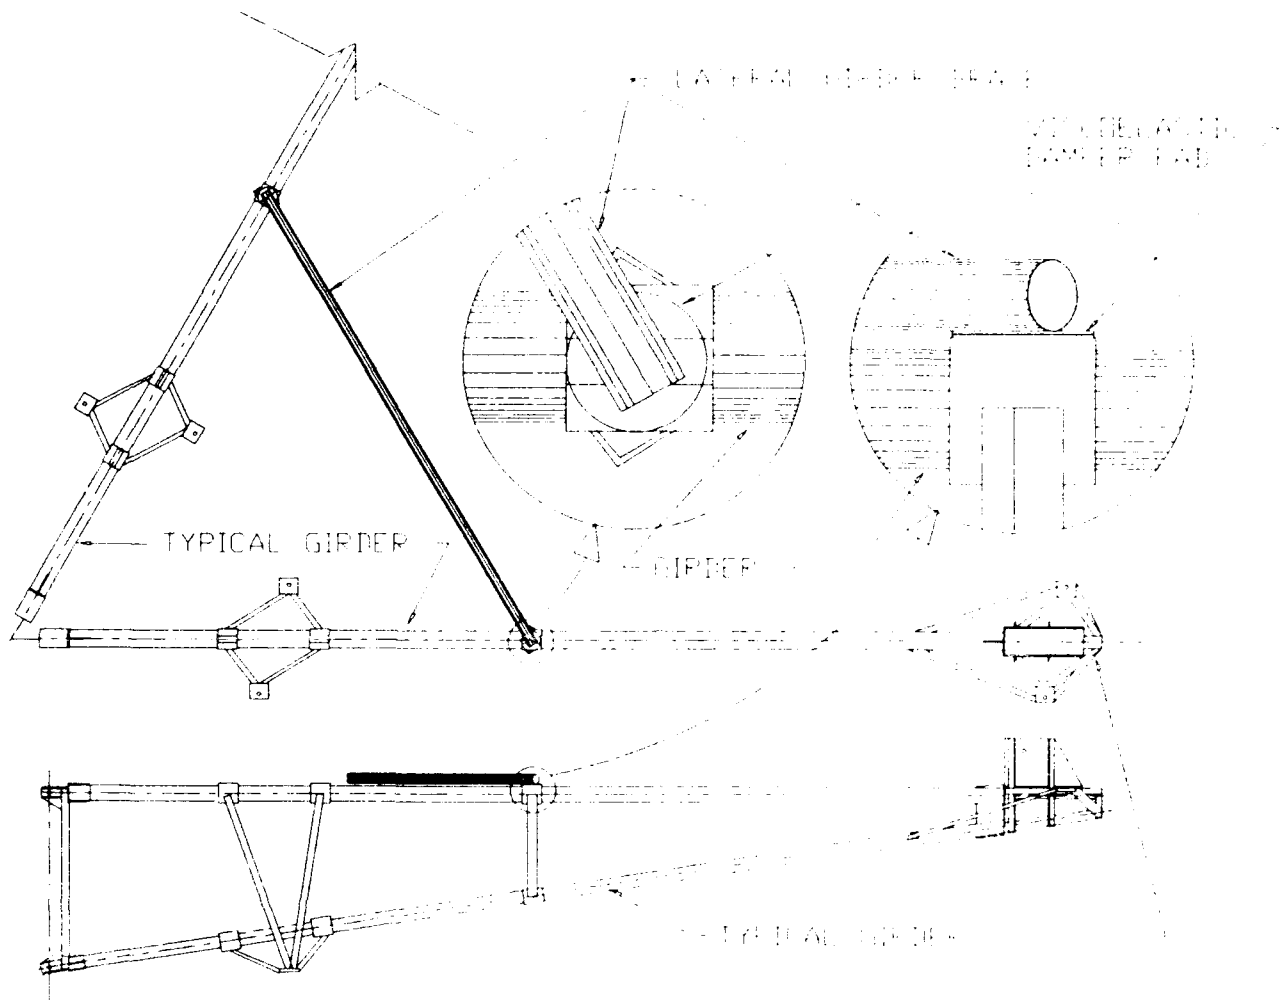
Stiffening & Damping of Lateral Modes in the Girders
